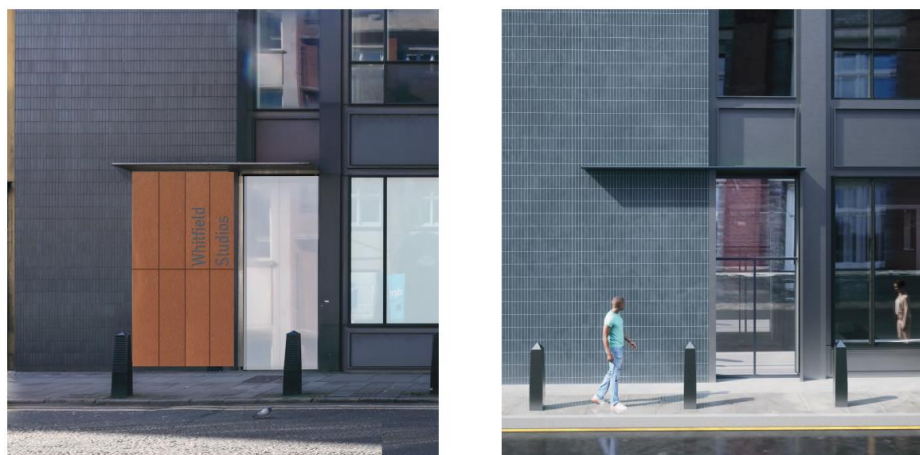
Approved and Proposed Whitefield Street Entrance (Source: Design and Access Statement, prepared by White Red Architects)
